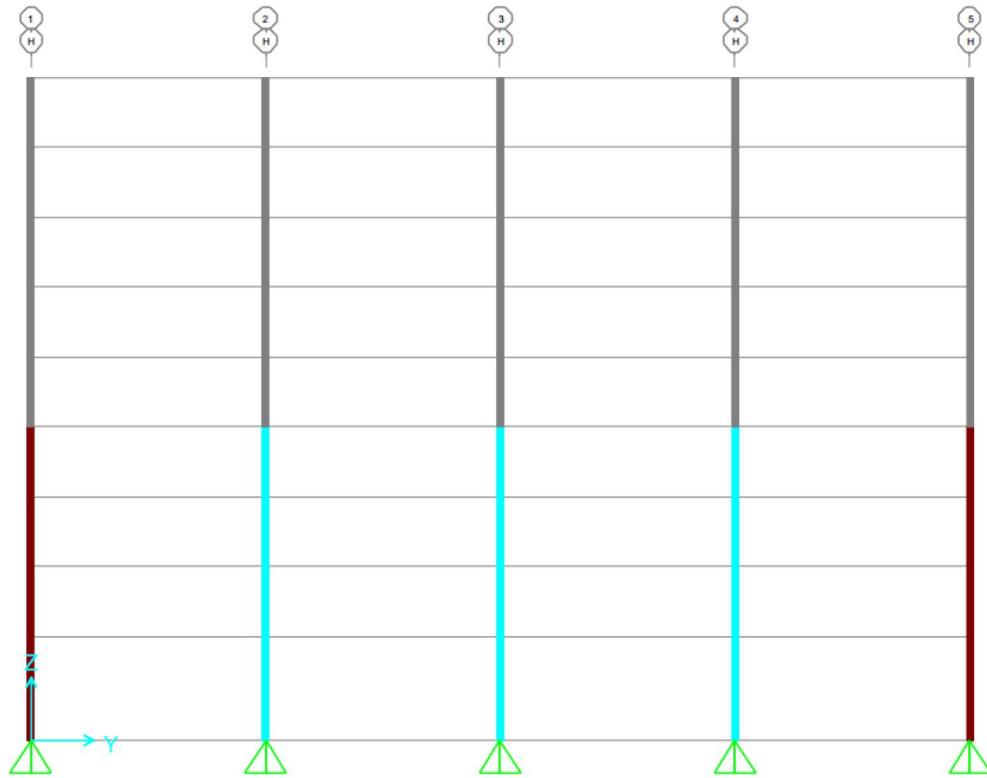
Column cross-section layout in the face H (SAP2000)
